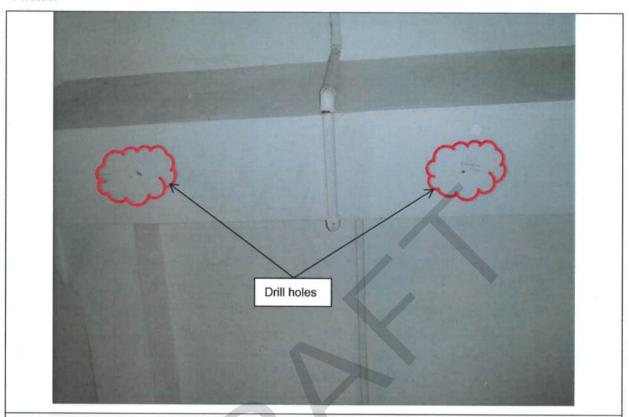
Drill holes in ceiling beams on level 2-3 stairs.
